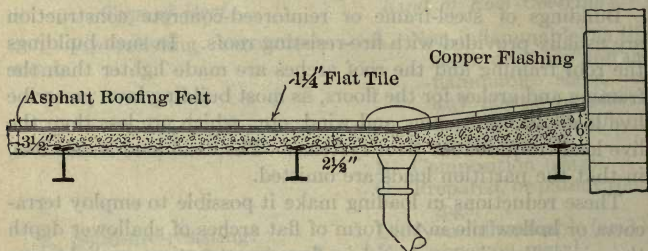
Concrete Roof Construction, U. S. Public Building, San Francisco.
